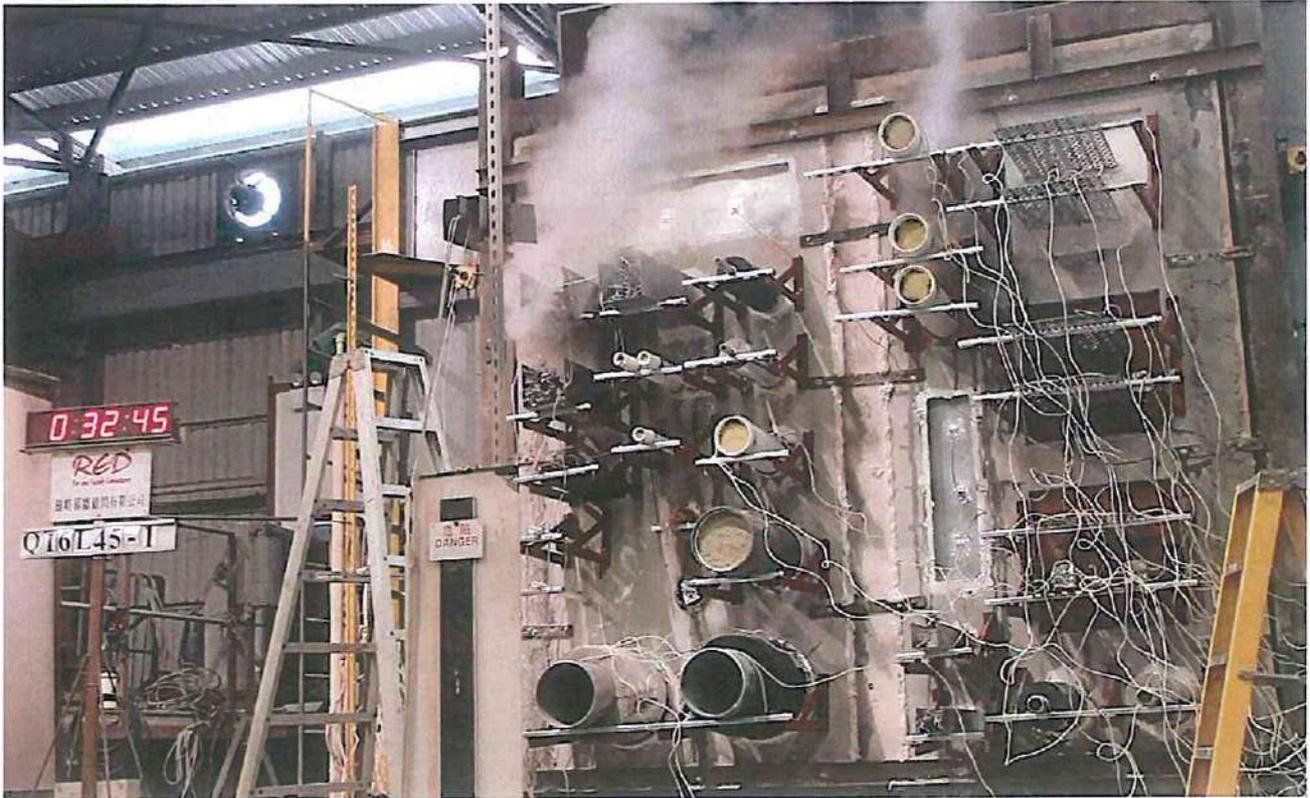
The unexposed face of the specimens after a heating period of 32 minutes.
